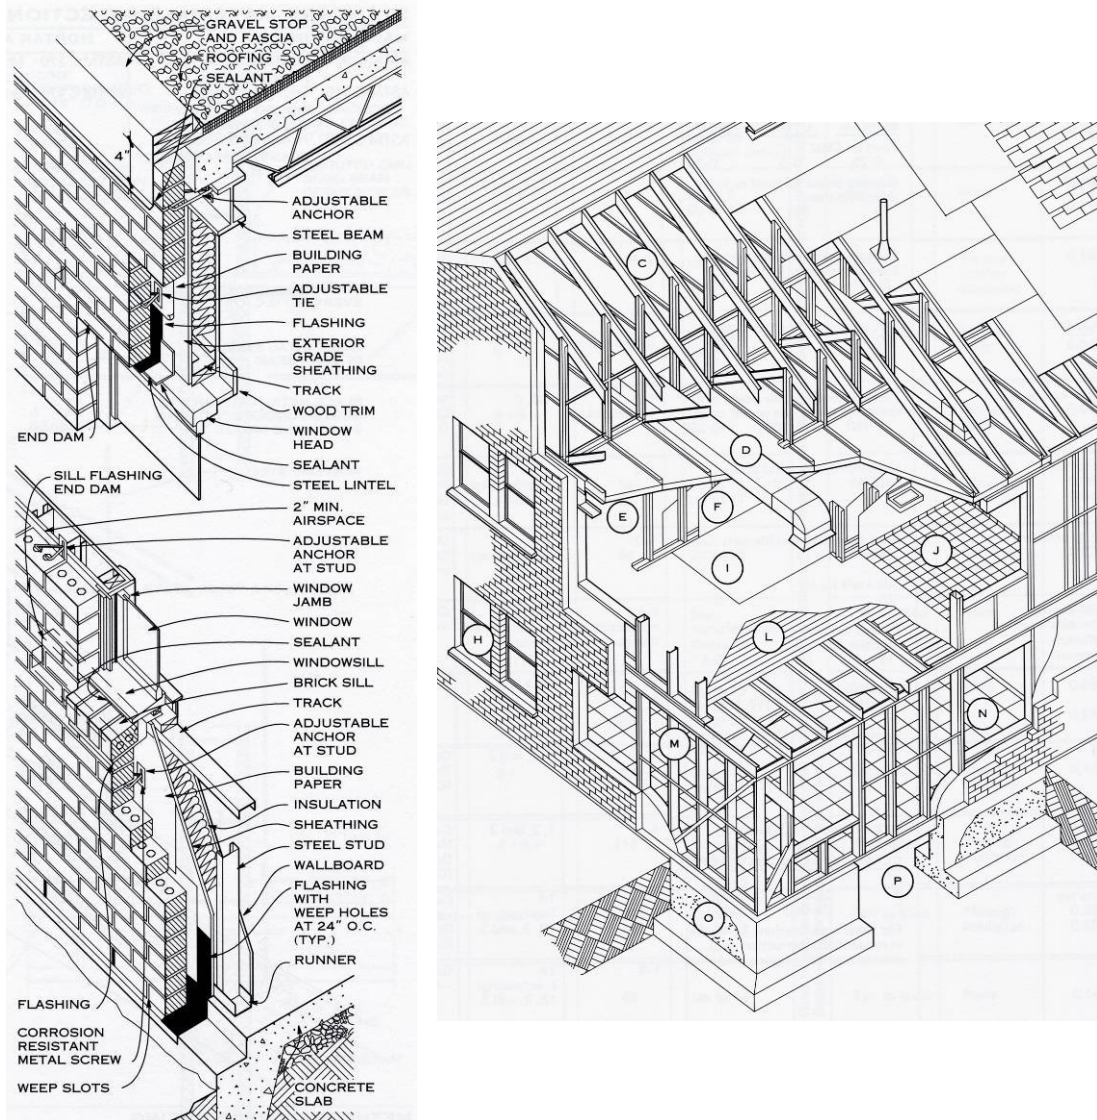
Typical details of brick veneer on light-gauge steel frame home construction (Rumbarger and Vitullo 2003).
